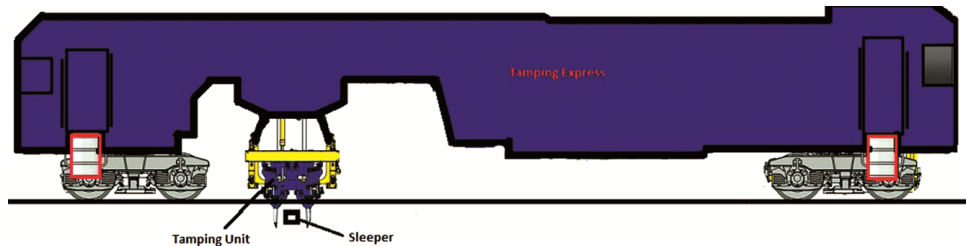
Schematic view of Unimat 08-4x4/4S track tamping machine.
